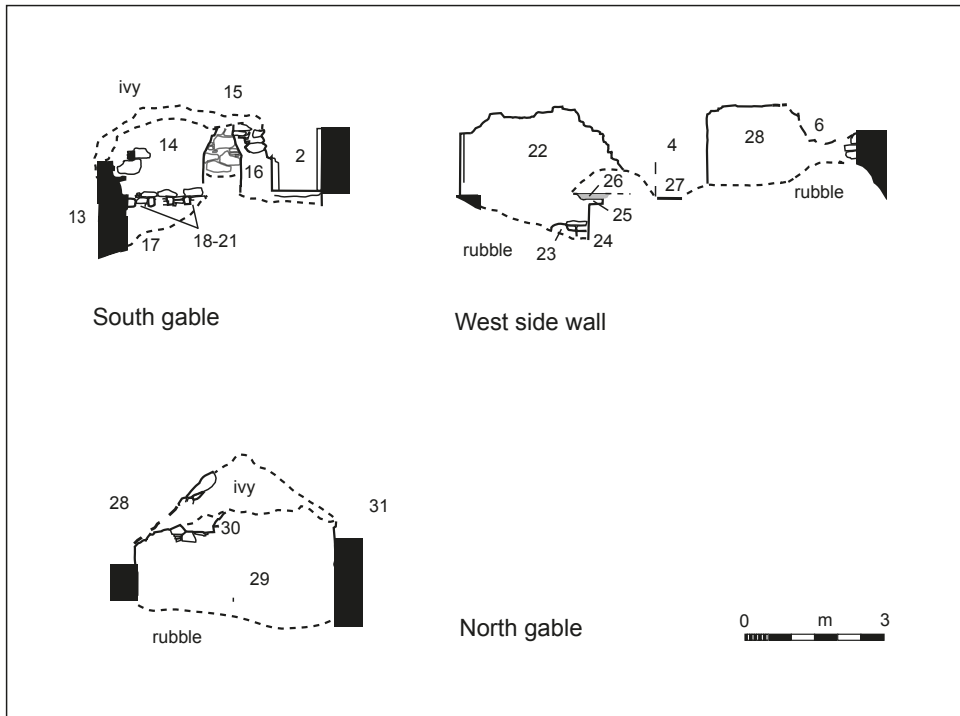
South gable, west wall and north gable internal elevations. (Drawing by John Pickin)
